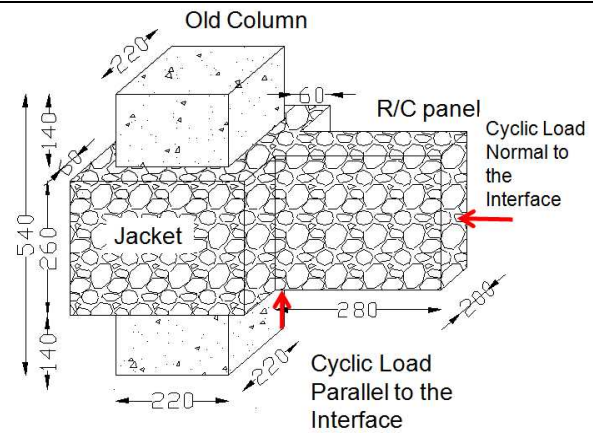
Specimen of a portion of an encased R/C panel and the jacketed column
